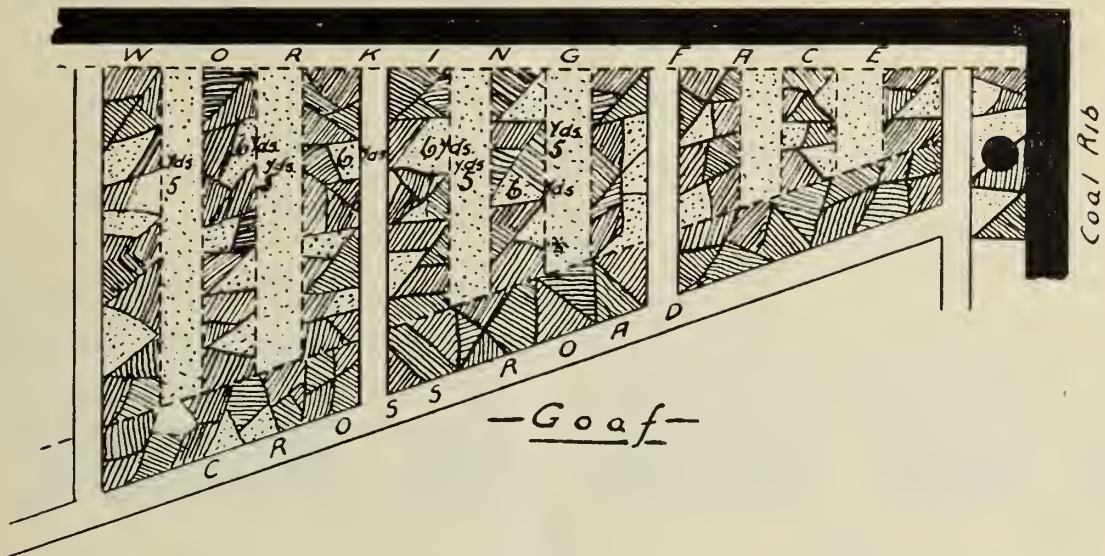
CANNOCK AND RUGELEY COLLIERIES. PLAN SHOWING PACKS AND WASTES.
